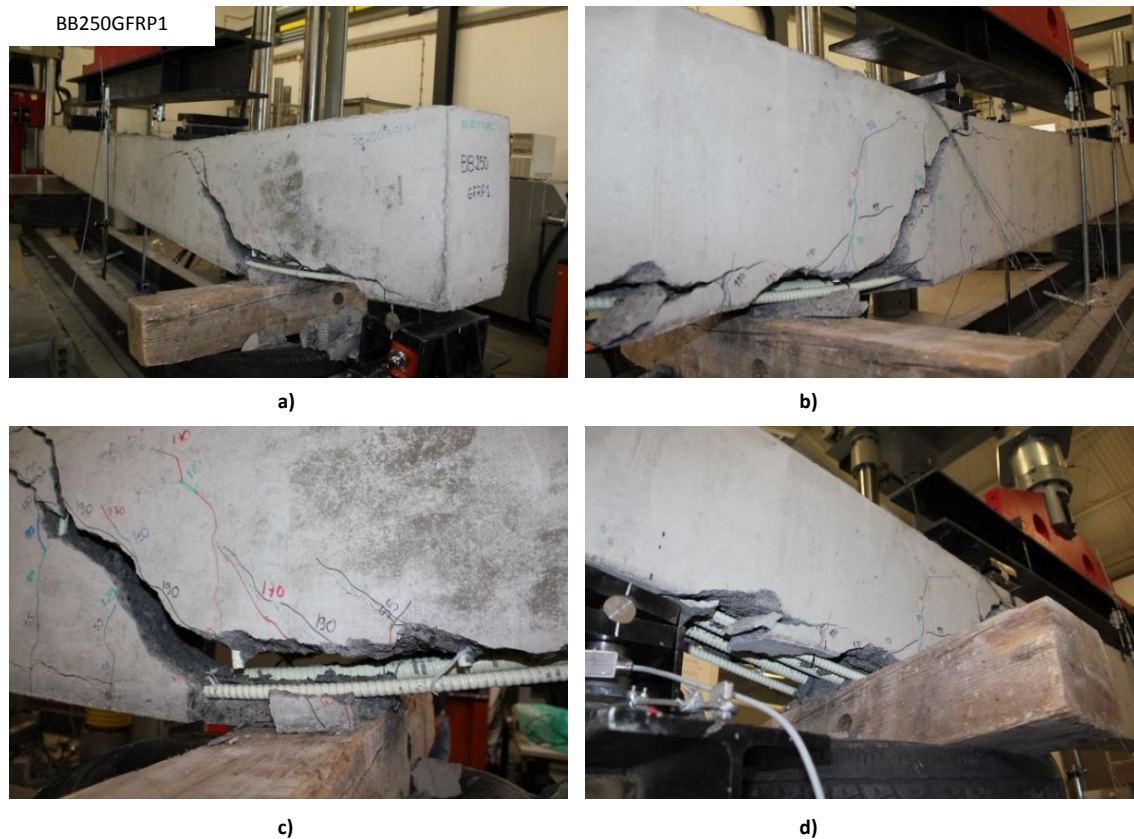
BB250GFRP1 beam failure: a) overall view of the failure; b) other side; c) pull-out of the shear reinforcement at the bottom; d) bottom longitudinal reinforcement pull-out
